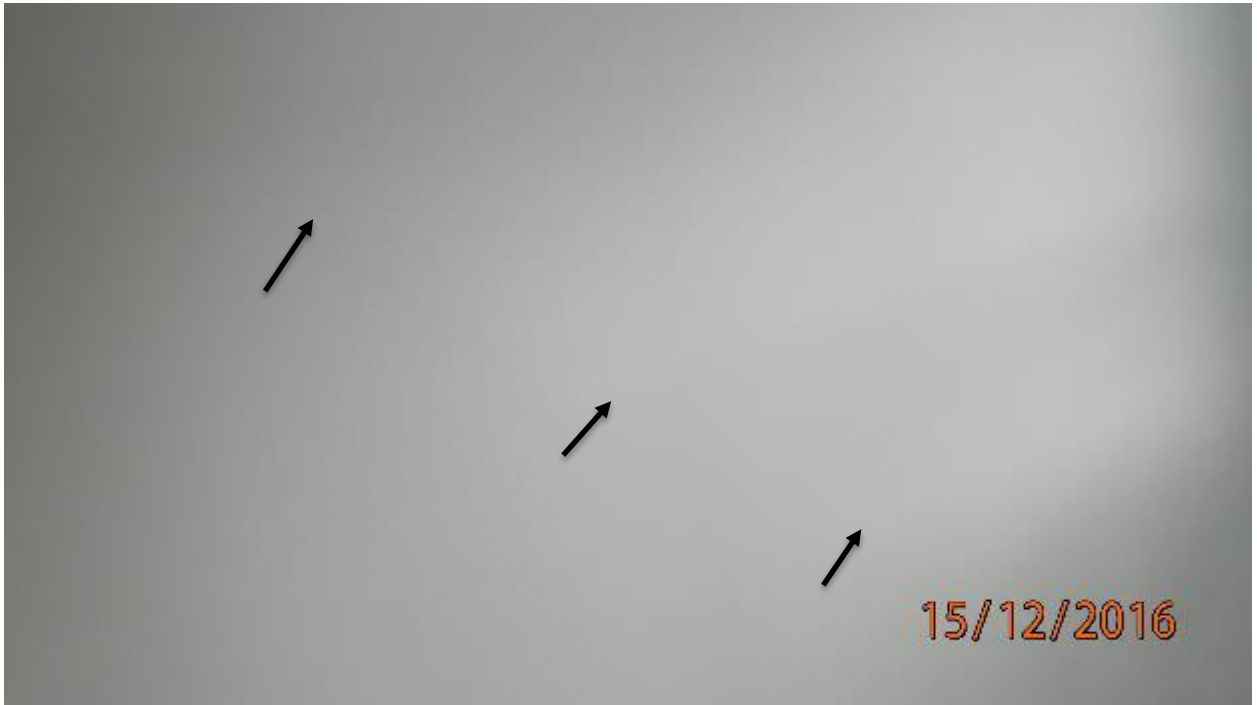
shows staining to the wide profiled plaster cornice on the eastern wall of the Kitchen.
